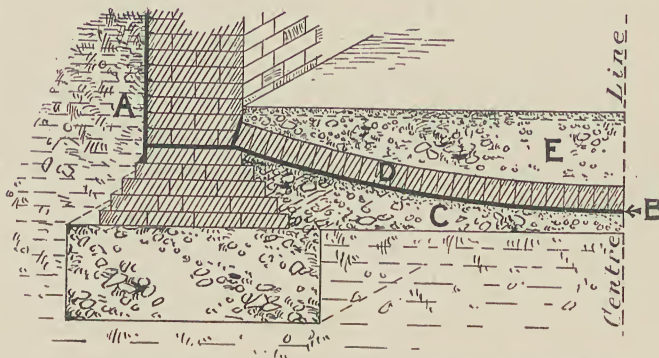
Asphalted Floor and Wall to resist considerable Pressure of Water.
